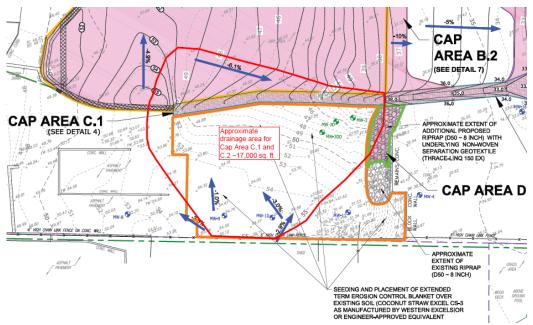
Approximate drainage area for Cap Area C.1 and C.2 channel (arrows depict approximate stormwater runoff flow direction).
